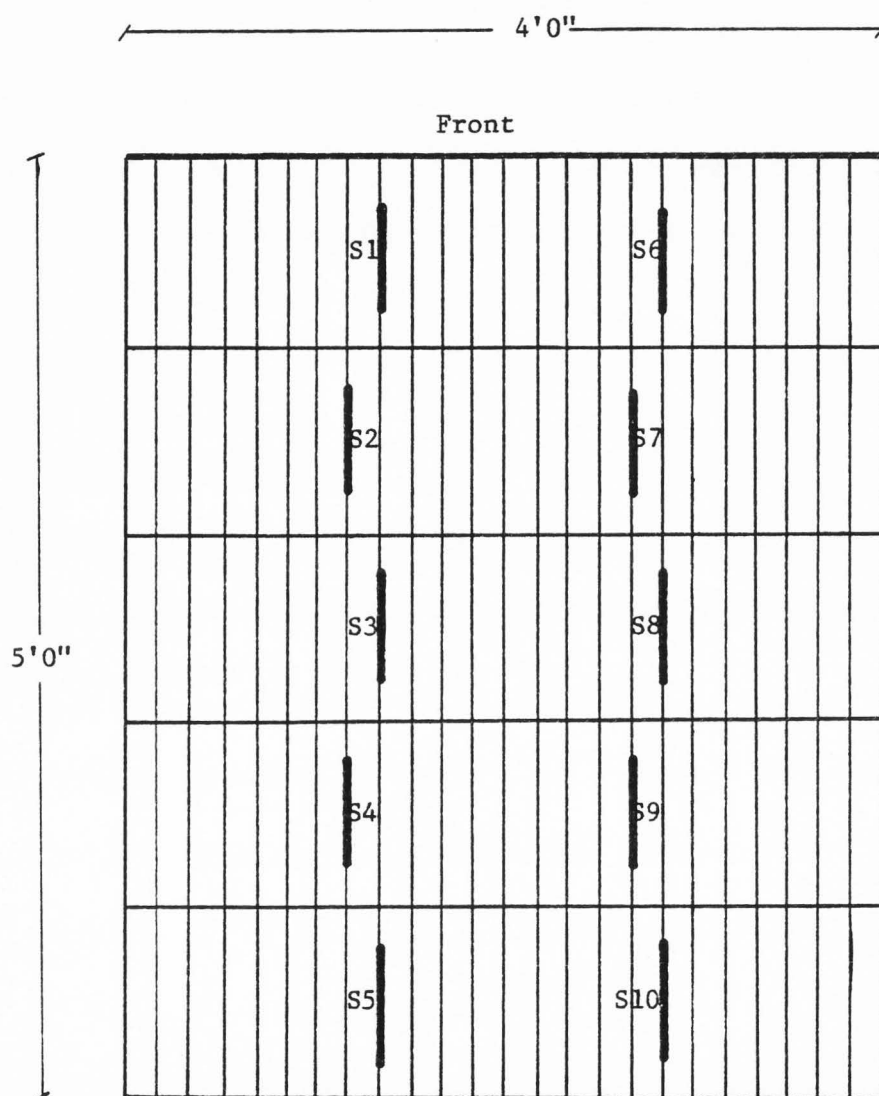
Plan view of instrumentation layout on wire mat for test wall.
